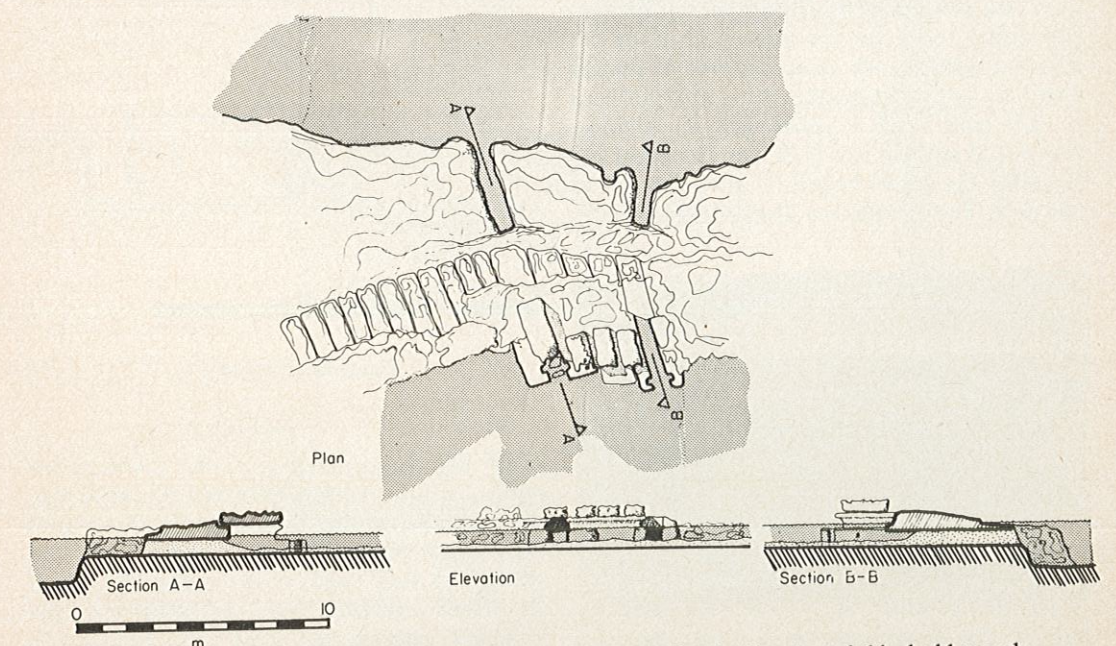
T 1 - detail of tunnelled channels at north end of tank. Note tunnels blocked by sand.
